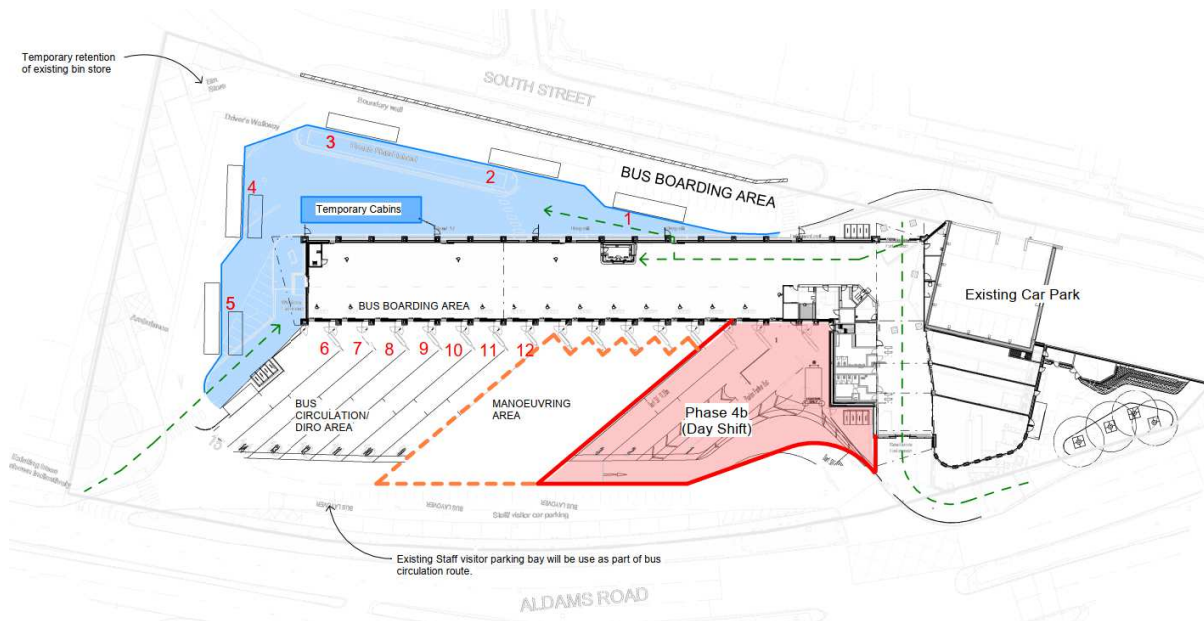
Phase 4b Plan – External Works to DIRO Bays
